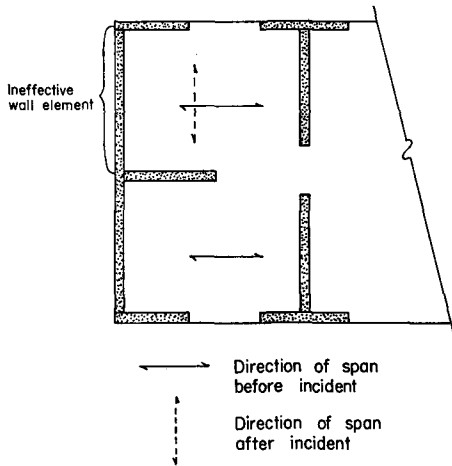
Change of slab span direction under the effects of abnormal loadings.
